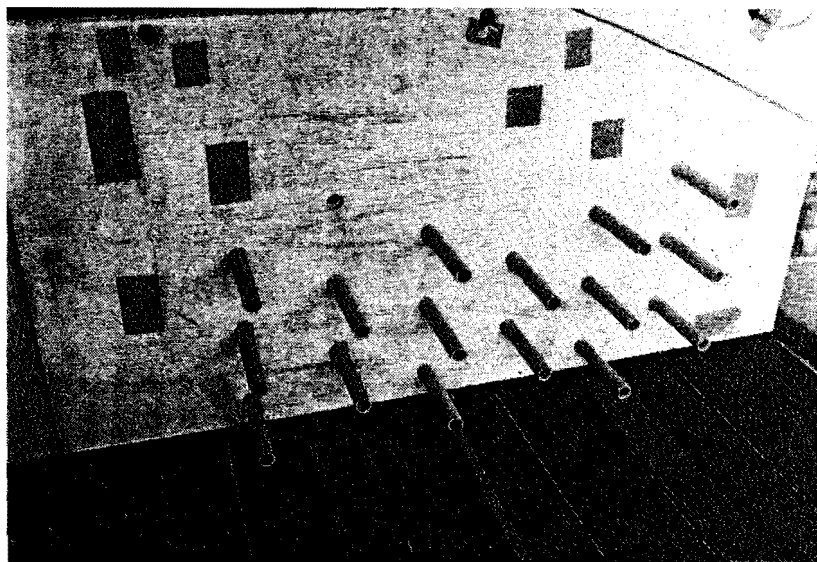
The pullout wall, showing PVC sleeves fitted.
